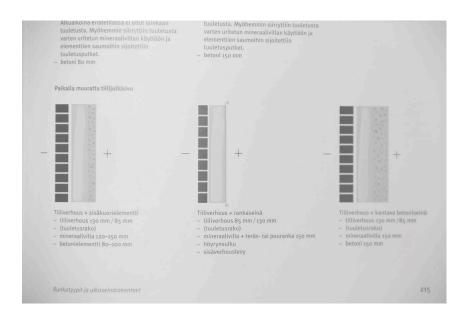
Examples 1970's frame types and exterior wall structures (6, p.215)
